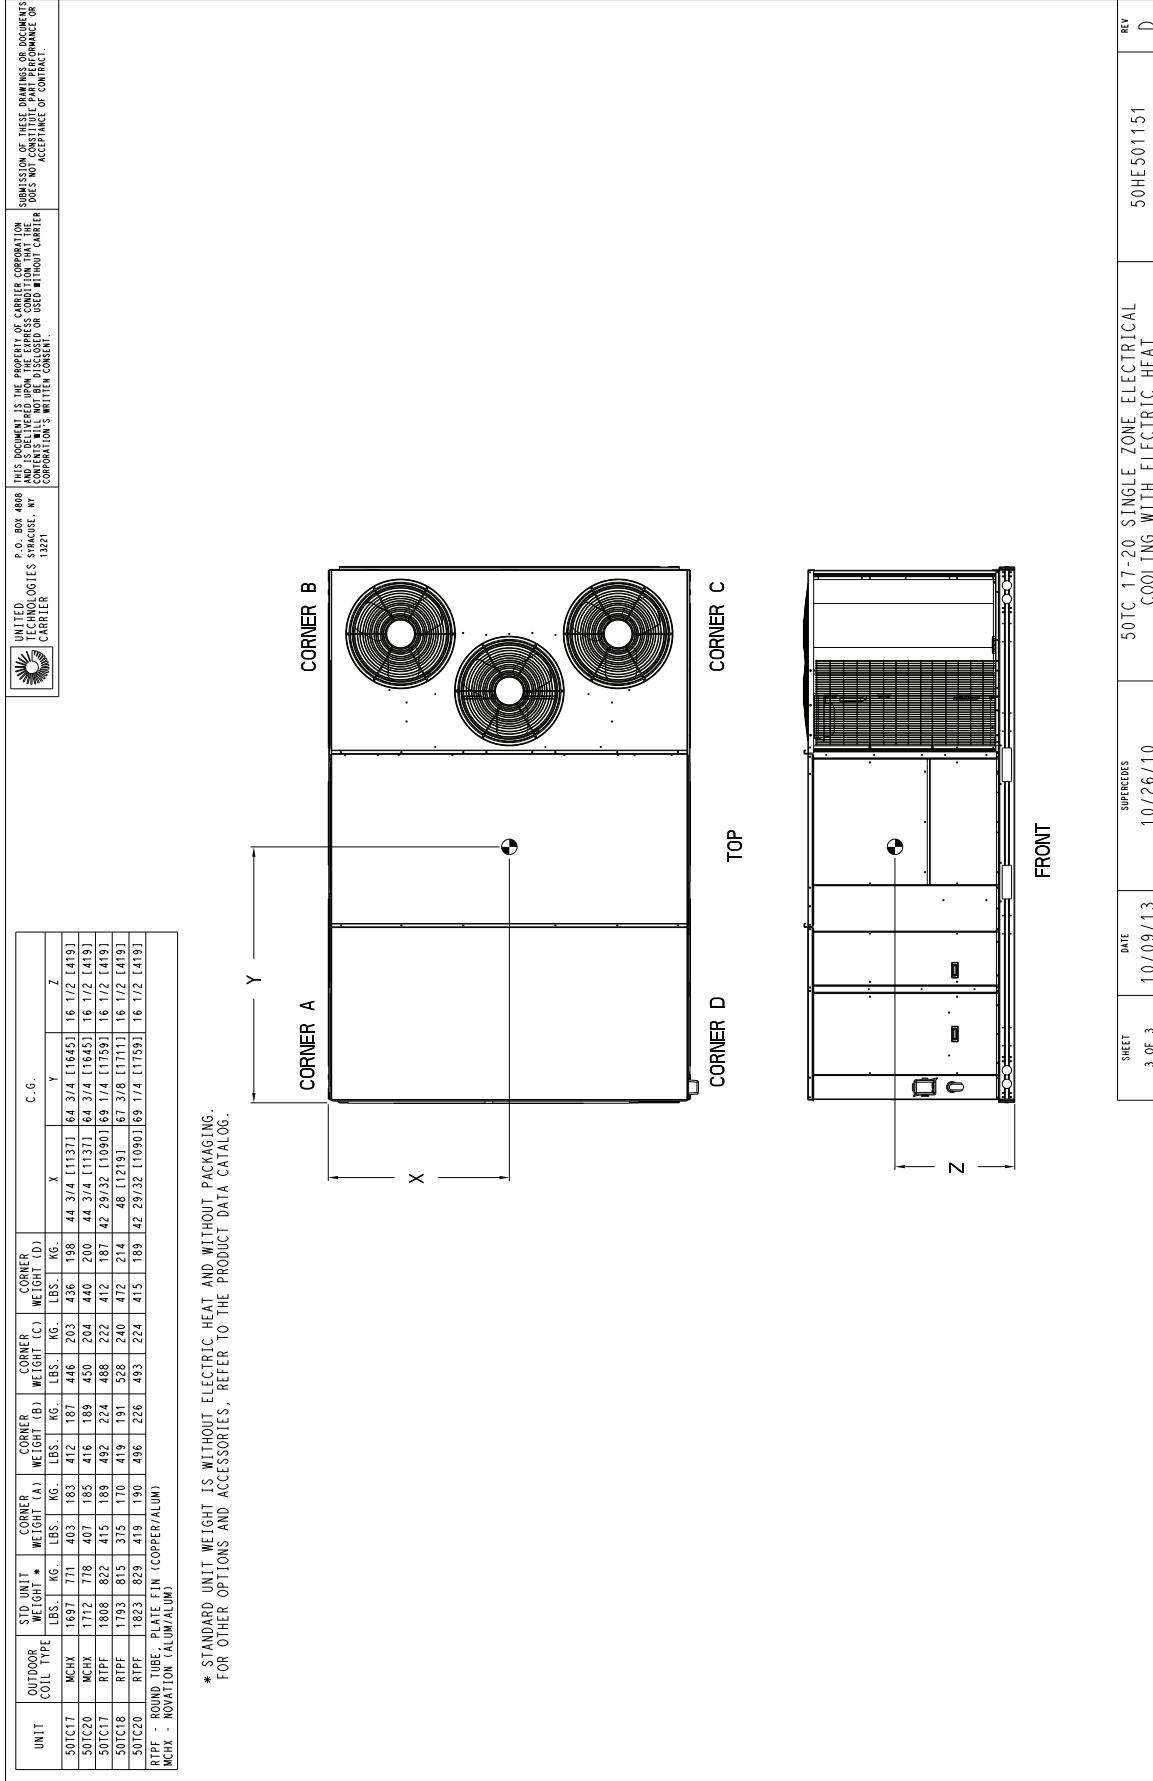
50TC\*\*17 and 20 Dimensional Drawing
